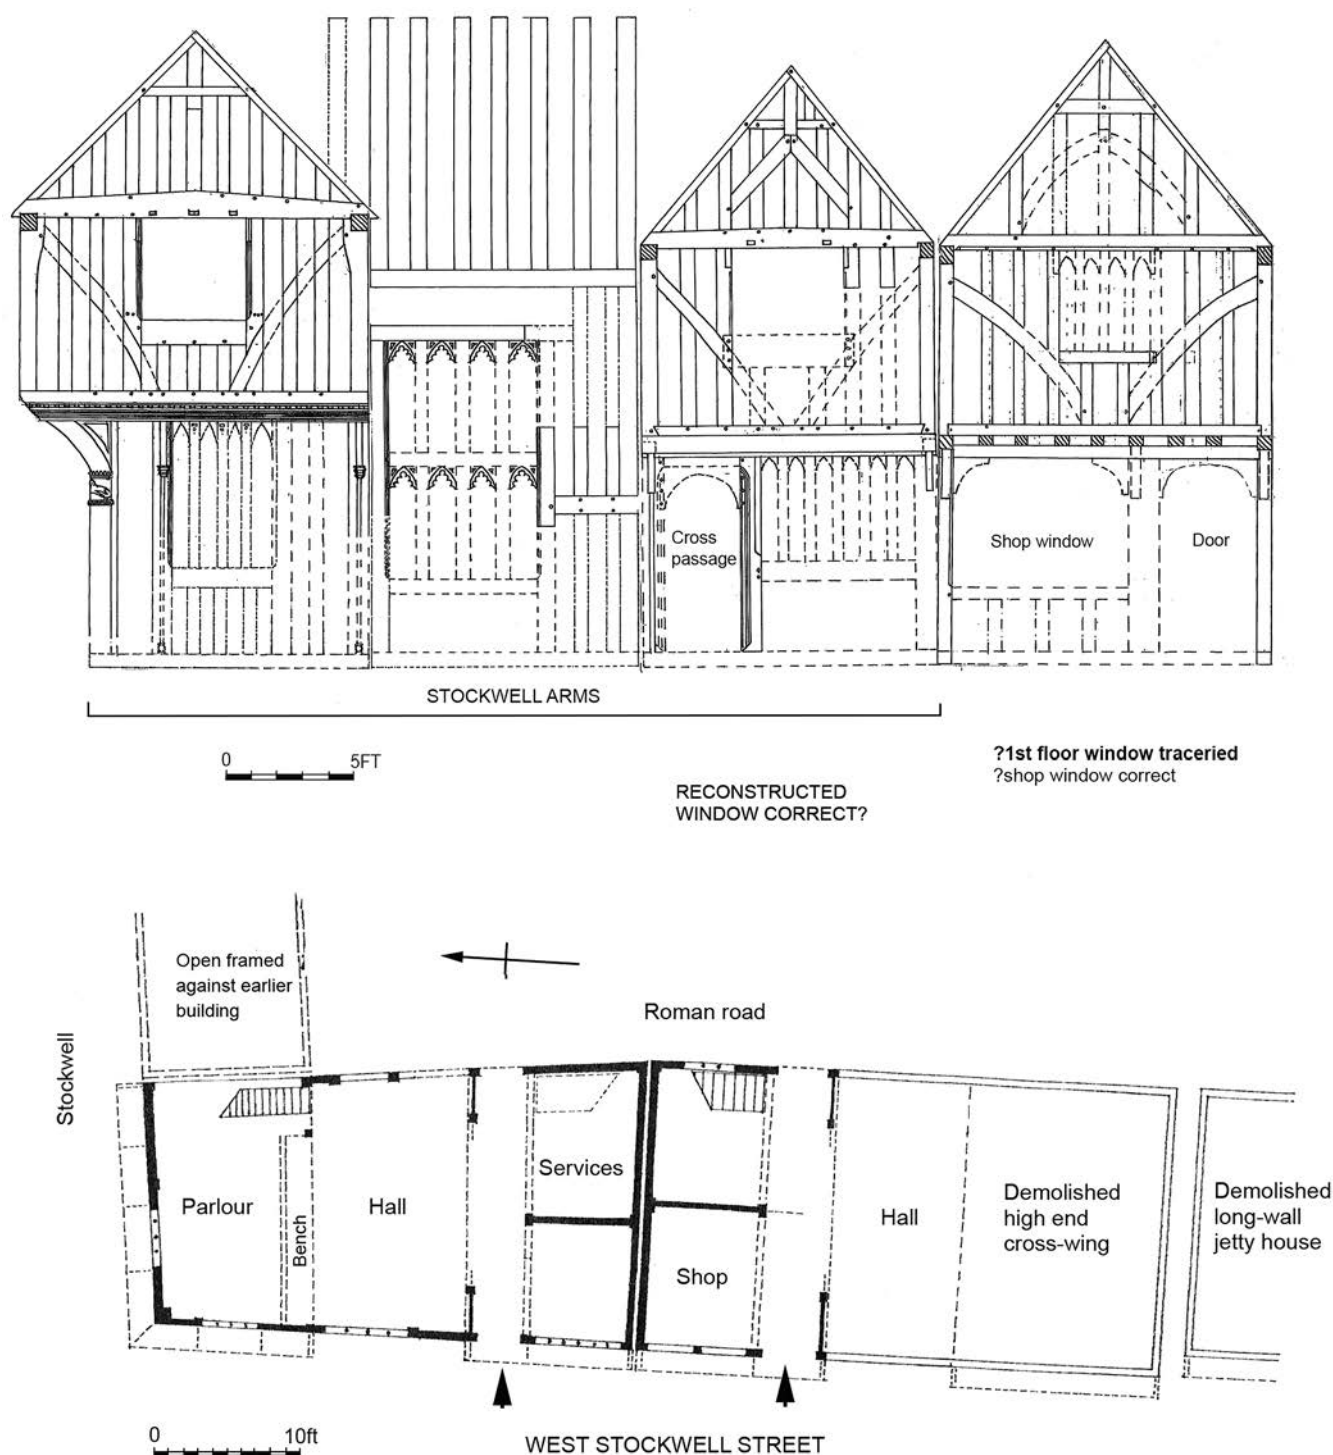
Plan and elevation of the former Stockwell Arms and the buildings to the south (elevation by Richard Shackle)
